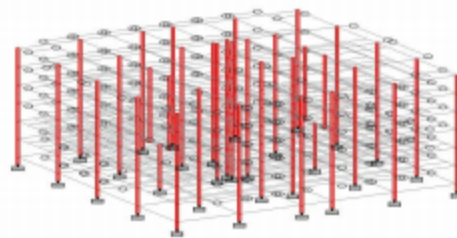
Floating column supported on Closely Supported beams in both directions The material properties of the structure are as follows Grade of concrete = M 25 Grade of Steel = Fe 415 Elasticity constant = $2.17 \times 10^7 \text{KN/..2}$ Further . The dead load includes loads that are relatively constant over time, including the weight of the structure itself, and immovable fixtures such as walls, plasterboard or carpet, roof etc.
